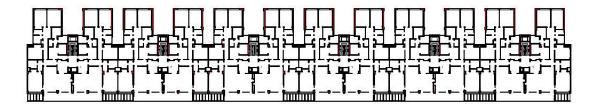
F. Mitjans: Illa Seida Housing building. Floor plan, Scale 1:1000. Redraw M. Lucchini.
